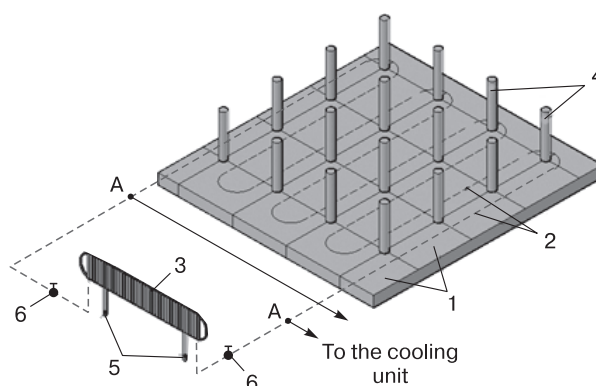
The layout of the elements of the GET system near the underfloor space (above-foundation structures are not shown):
